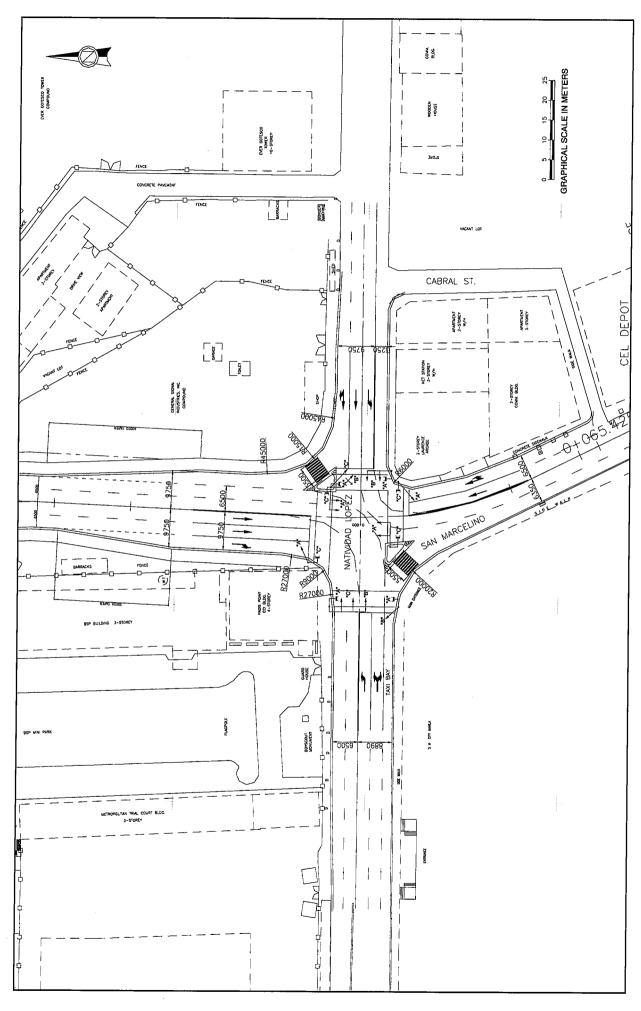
Plan of Intersection along Natividad Lopez (Concepcion)
